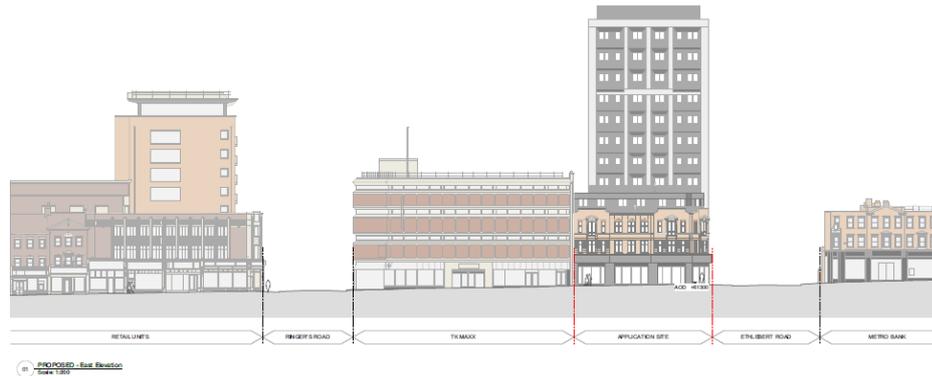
East / High Street Elevation of the previous refused scheme reduced from 16 to 12 storeys.
